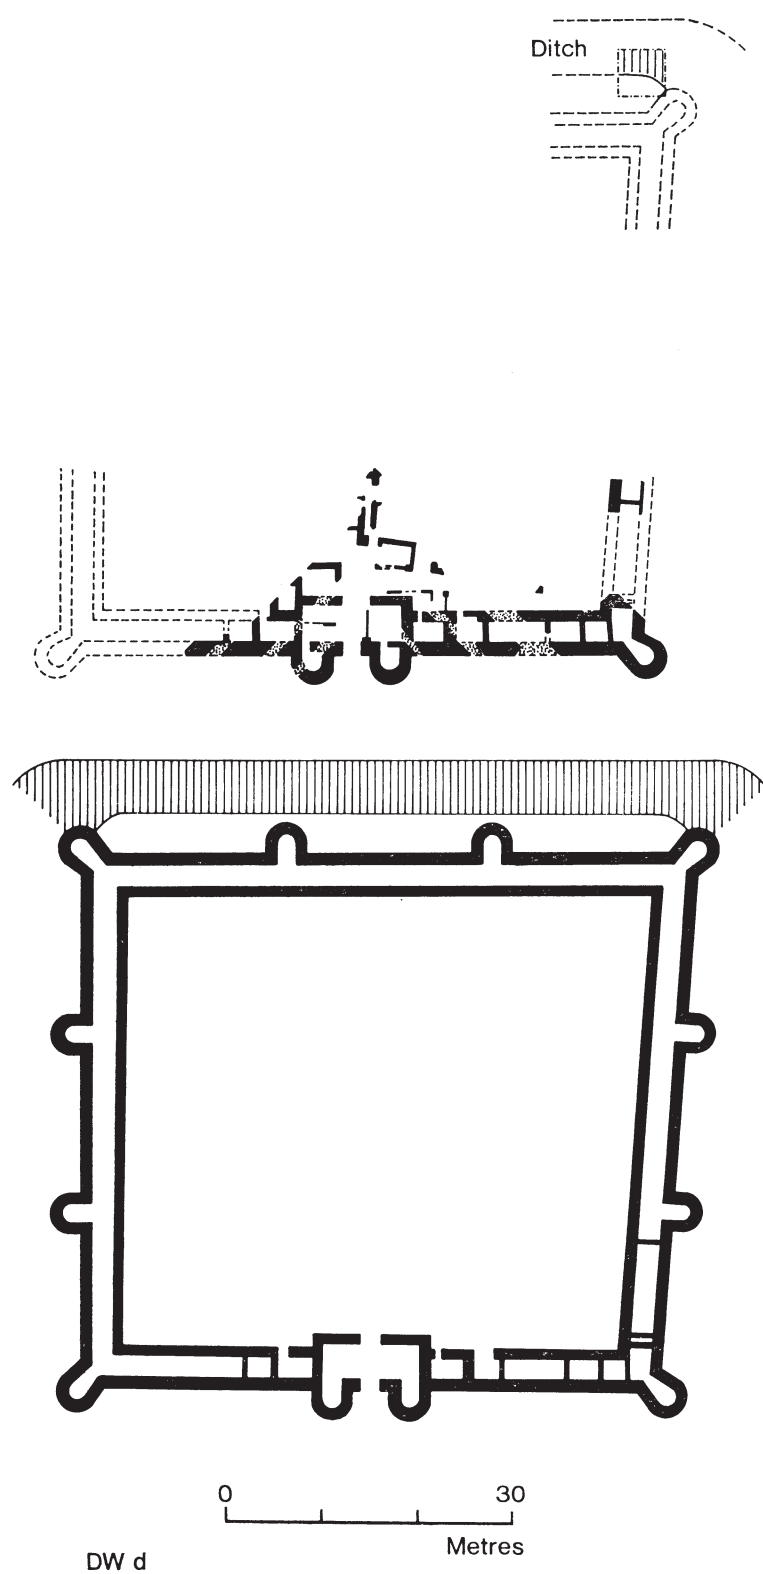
The Sasanian fort at Site B, showing excavated structures (above) and the conjectured plan (below).
